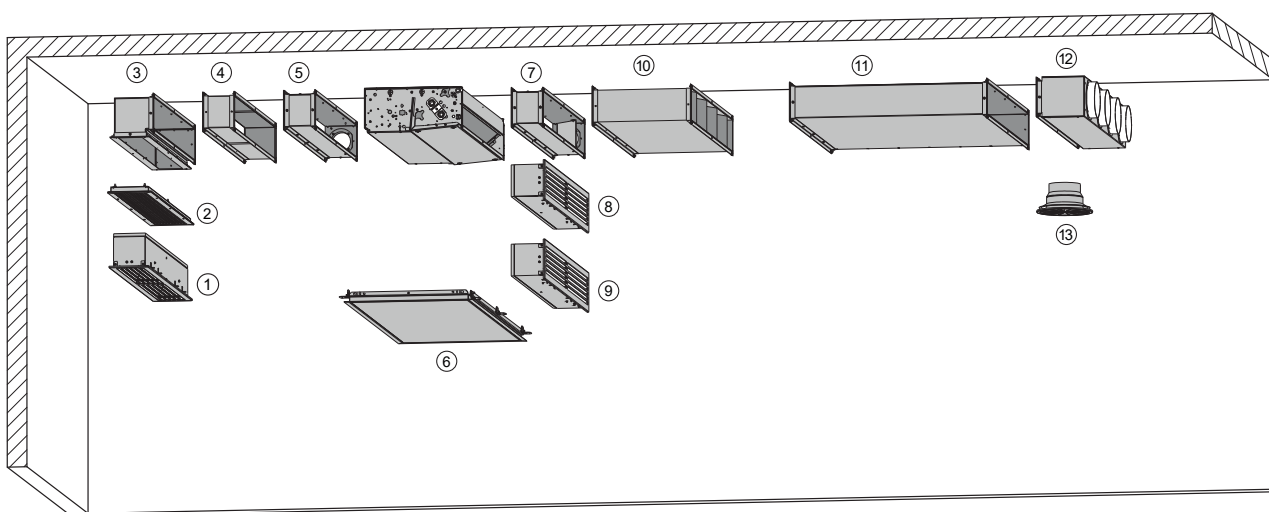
Diagram of arrangement of sheet steel accessories for ceiling-mounted units
